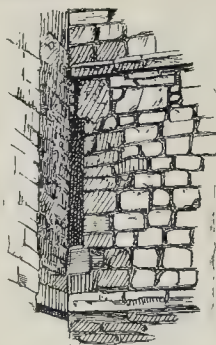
Junction of Tower and West Wall, Monkwearmouth.
